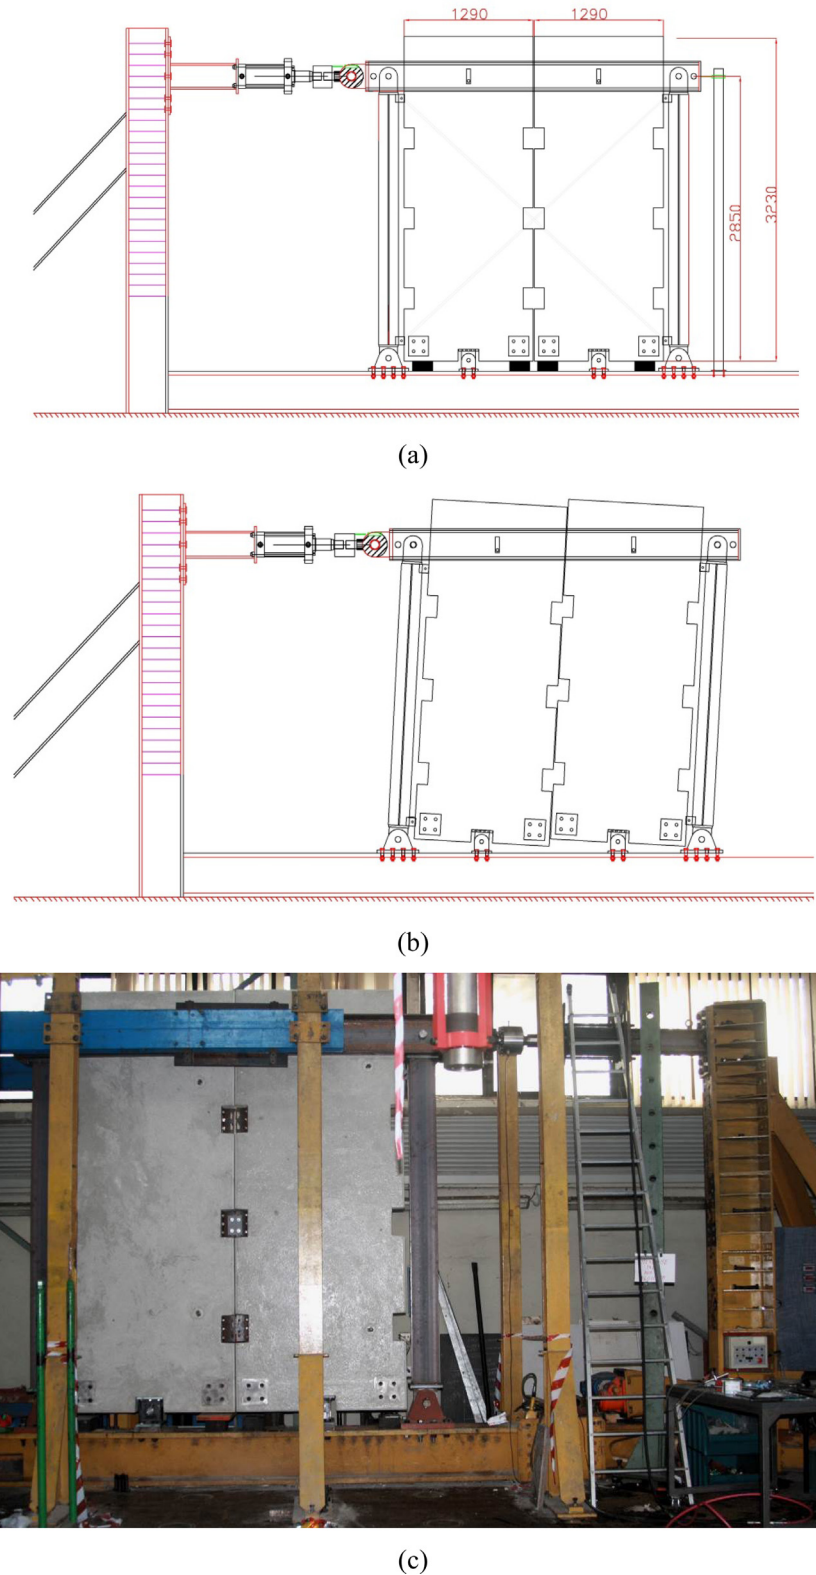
Setup for panel sub-assembly tests: (a) geometrical dimensions (mm), (b) kinematics of the panels, and (c) view of the assembly.
